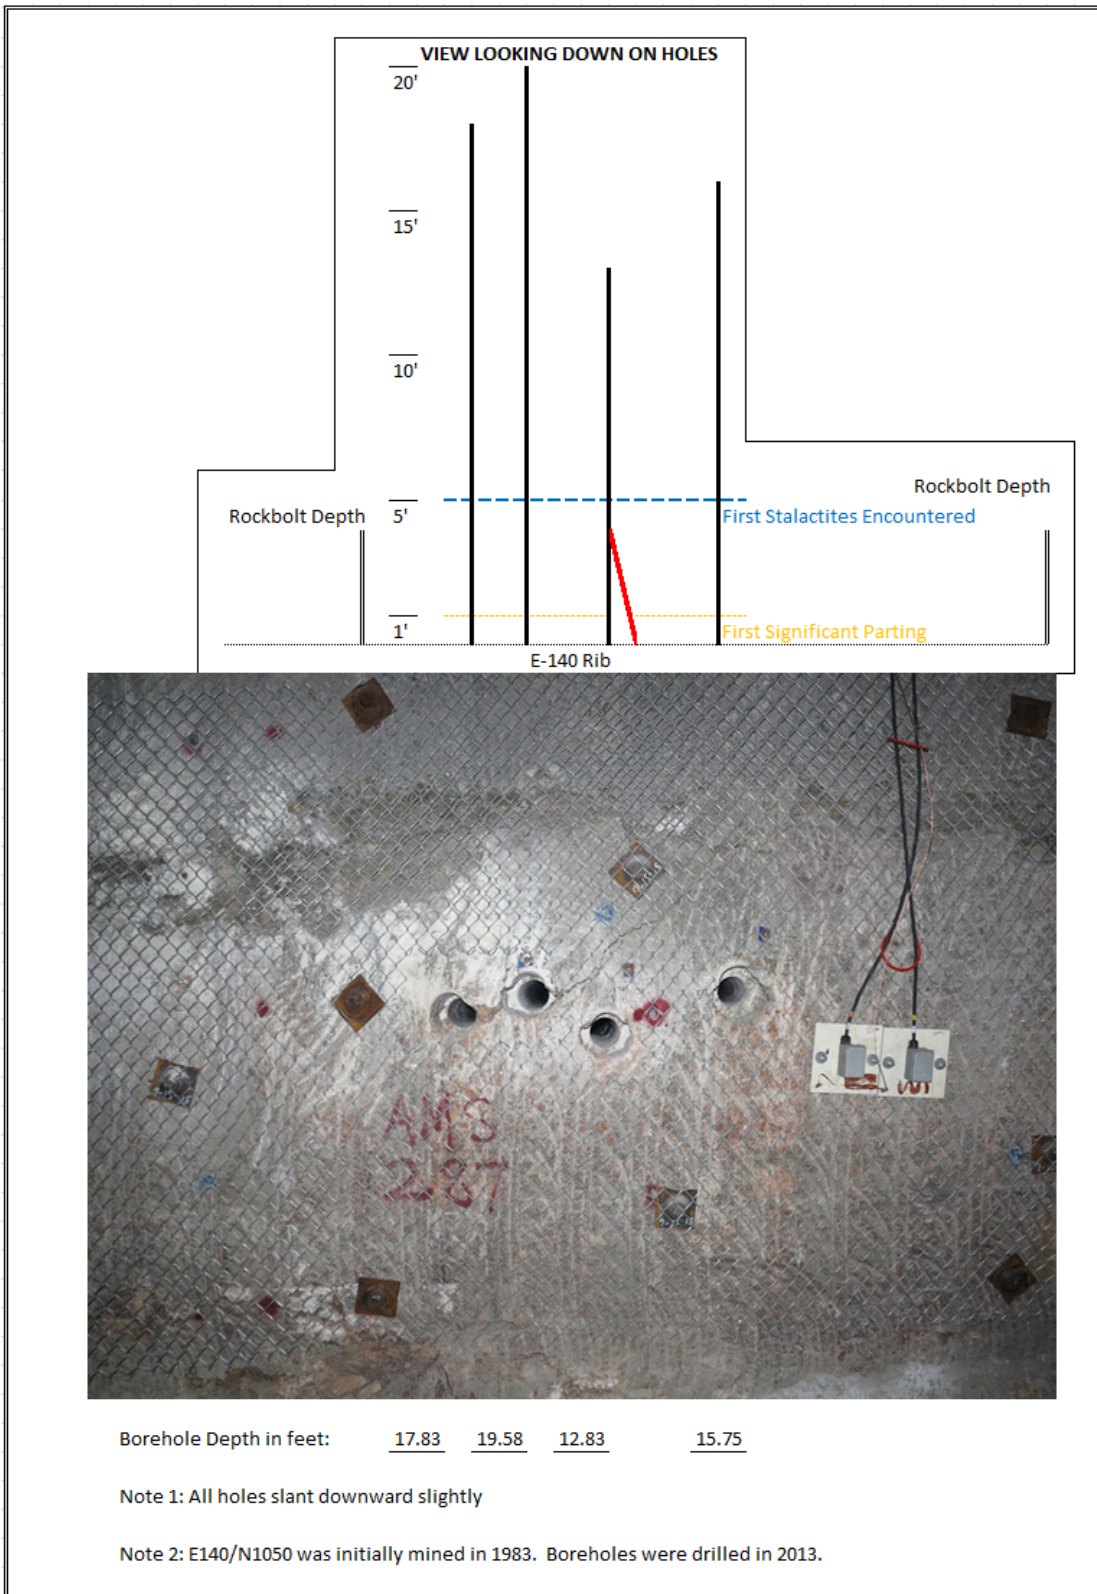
Existing sub-horizontal 4-borehole layout at WIPP.
